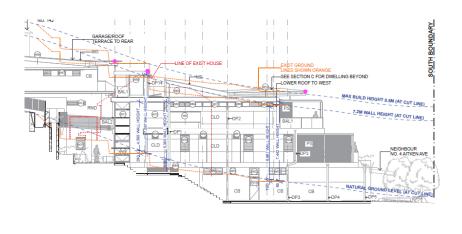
Height poles position highlighted in pink (superseded western elevation plan)
